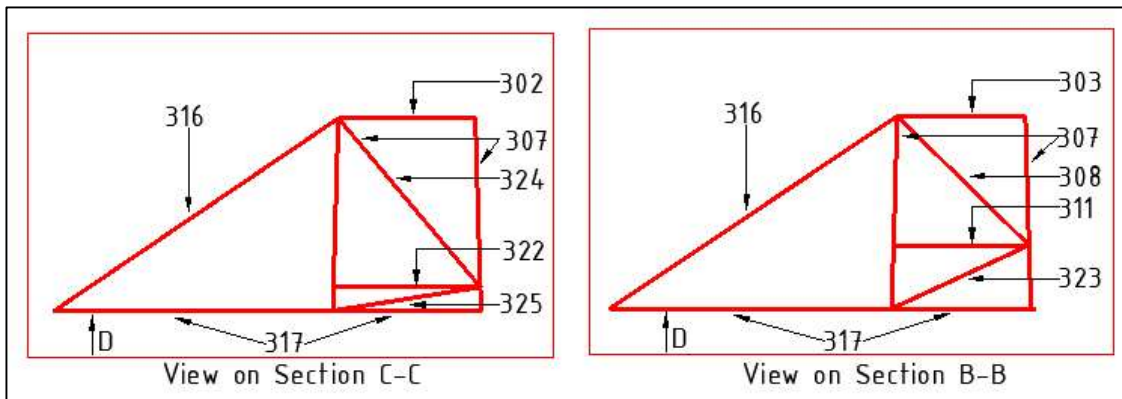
Internal bracing arrangements for the extension frame on the upper crossarm
